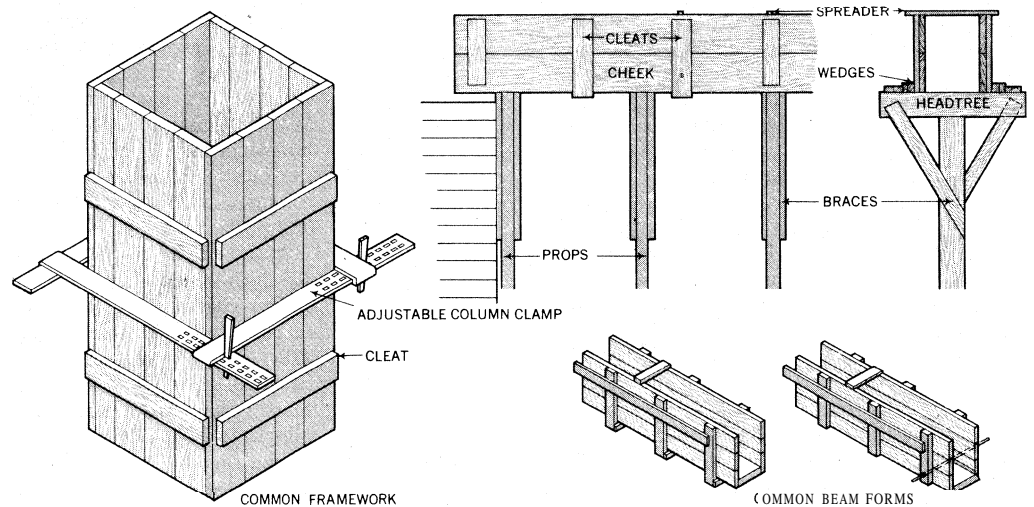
FORMWORK FOR CONCRETE LINTEL AND CONCRETE COLUMN
